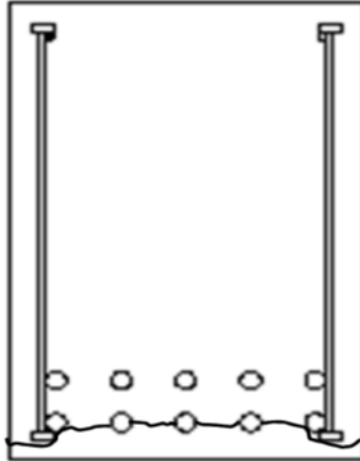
Splitting cracks not intercepted by headed deformed bars serving as transverse reinforcement.
